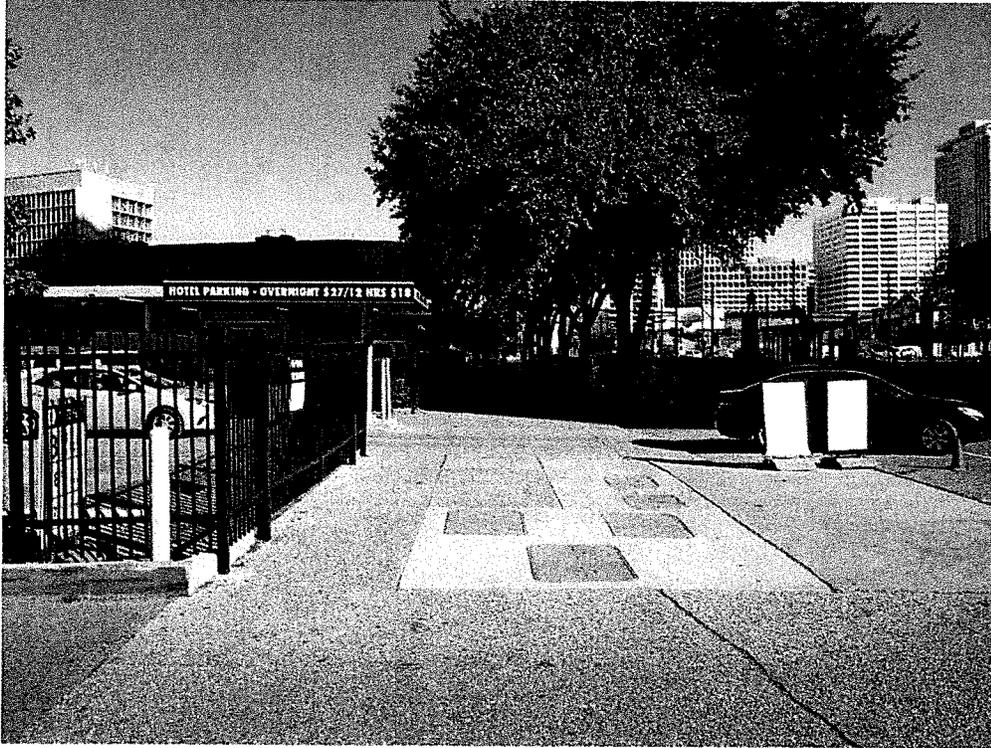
Loyola Ave / Girod St corner, view to Poydras
